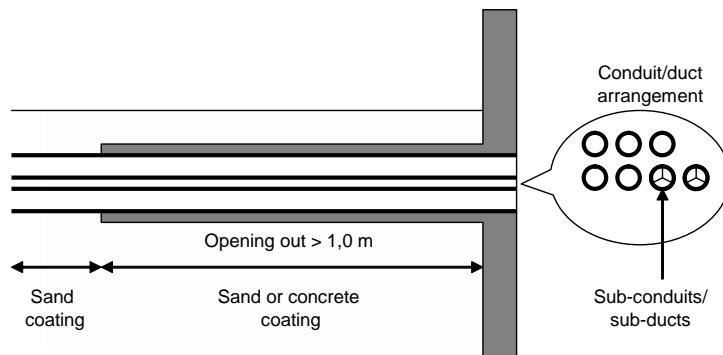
Example of an underground conduit entrance for information technology cables into a building
